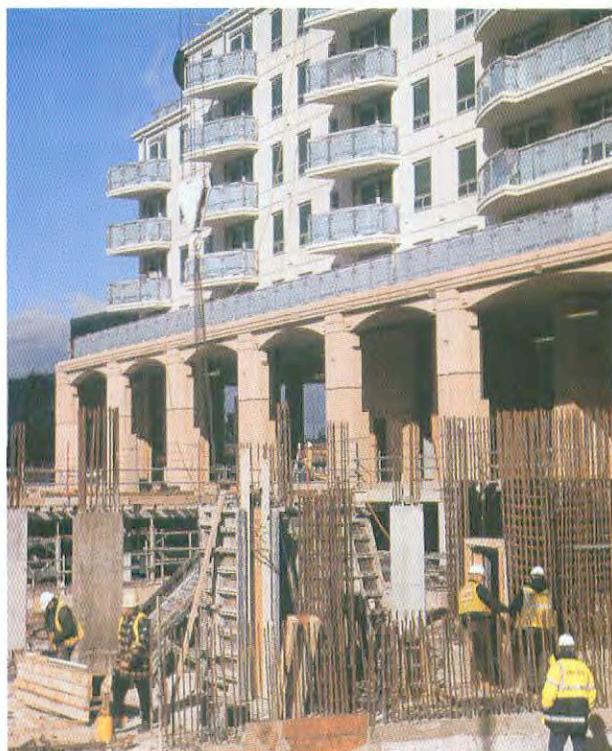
Precast cladding on cast *insitu* frame - 750 apartments at St George Wharf, London. (Courtesy of Thomas Telford Ltd., London)
